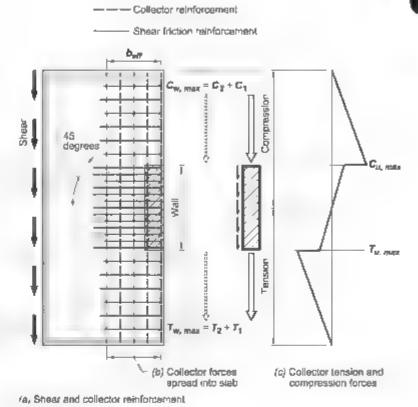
Collector wider than the shear wall, forces are reversible
